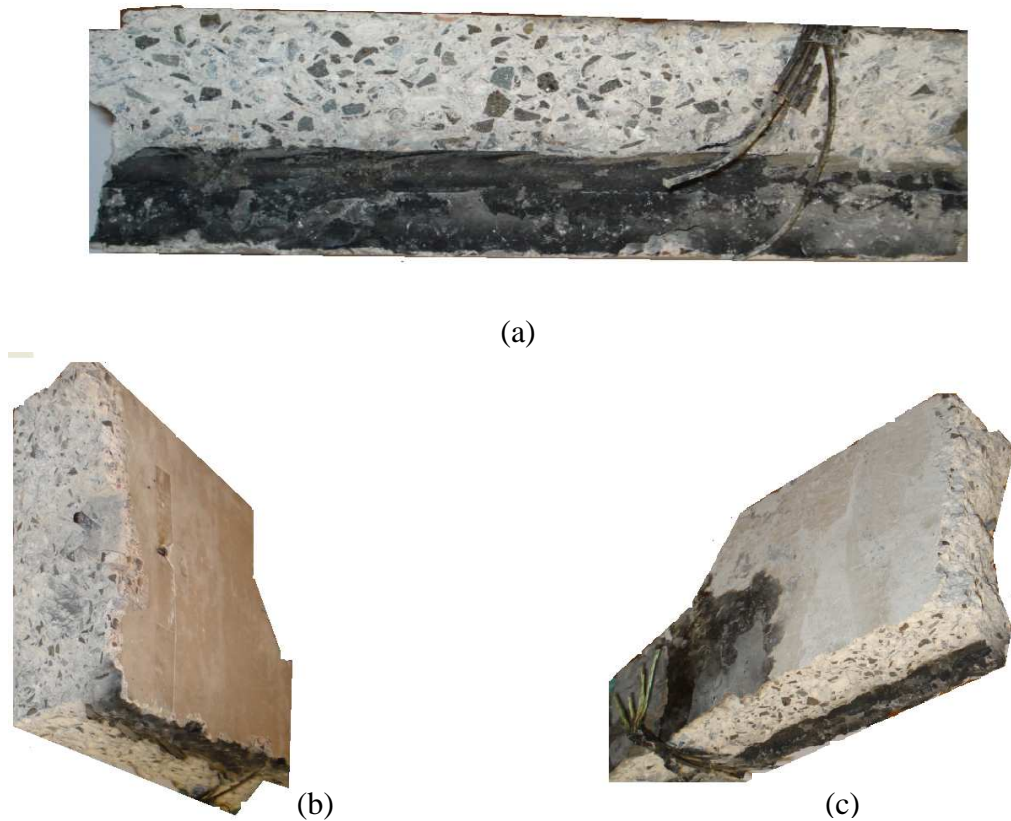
Excavated section of Slab C (a) profile (b) exposed soffit and (c) unexposed surface.
